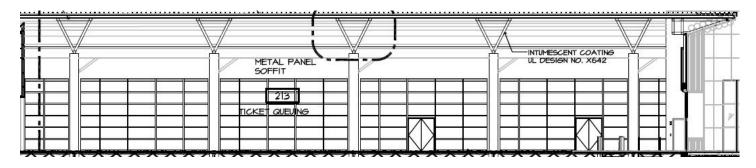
Ticket Queuing and Waiting Lounge/Meeting Rooms Section
